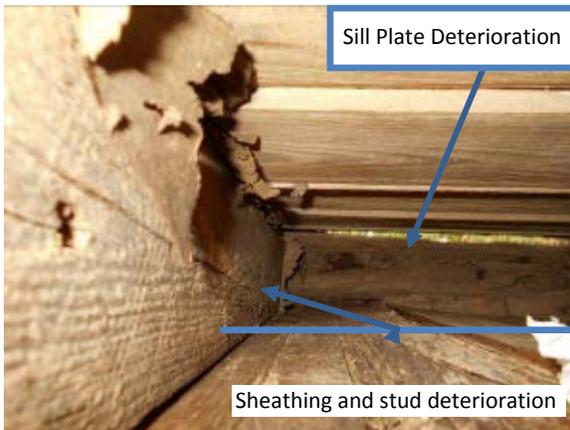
Deteriorated Wood Framing @ Base of Exterior Wall.
